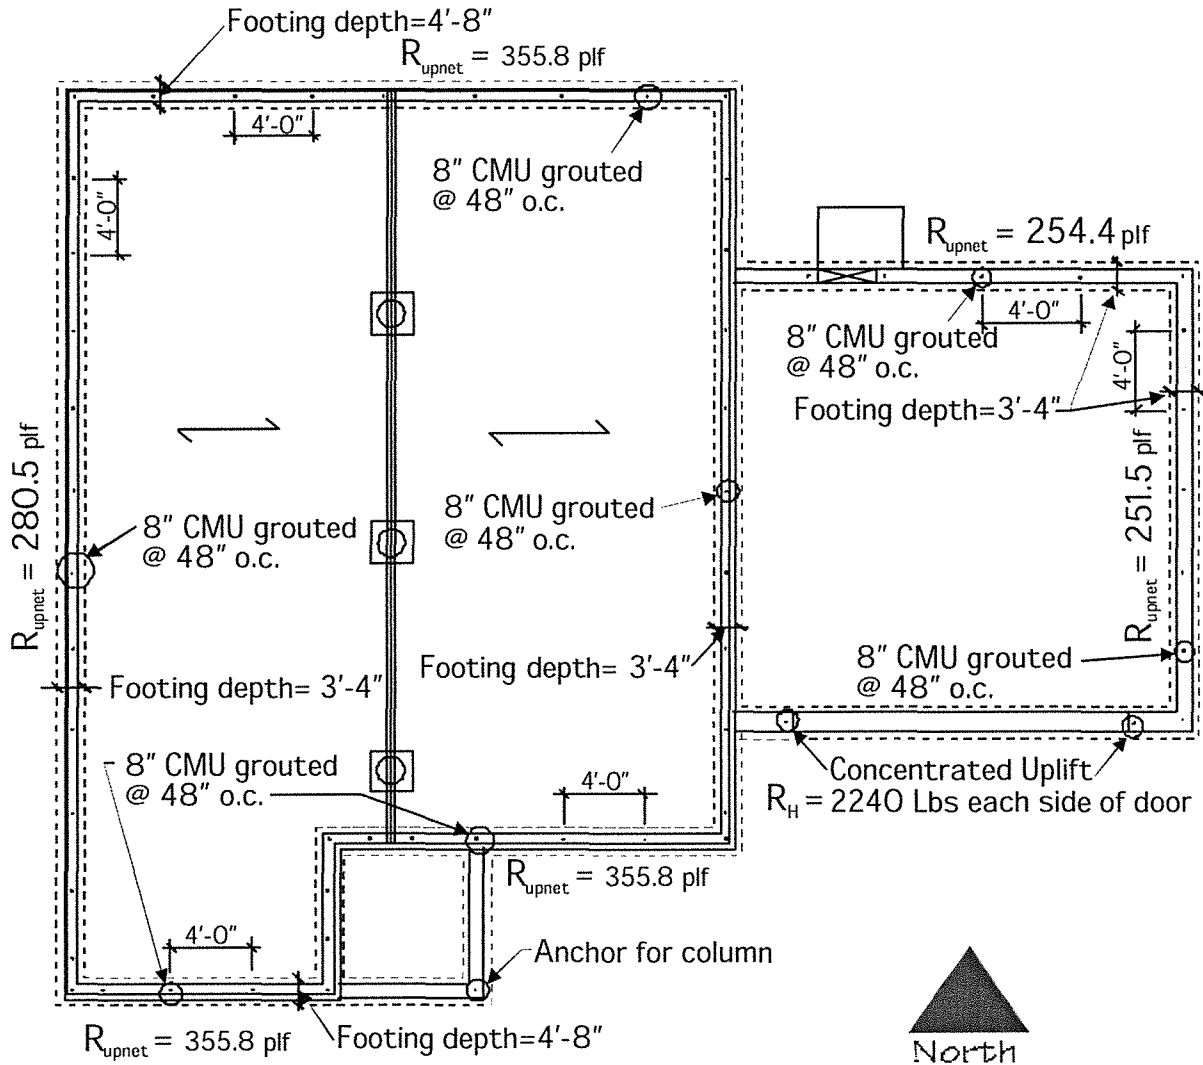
Summary of Net Uplift Forces at Foundation, Vertical Reinf. & Footing Depth
